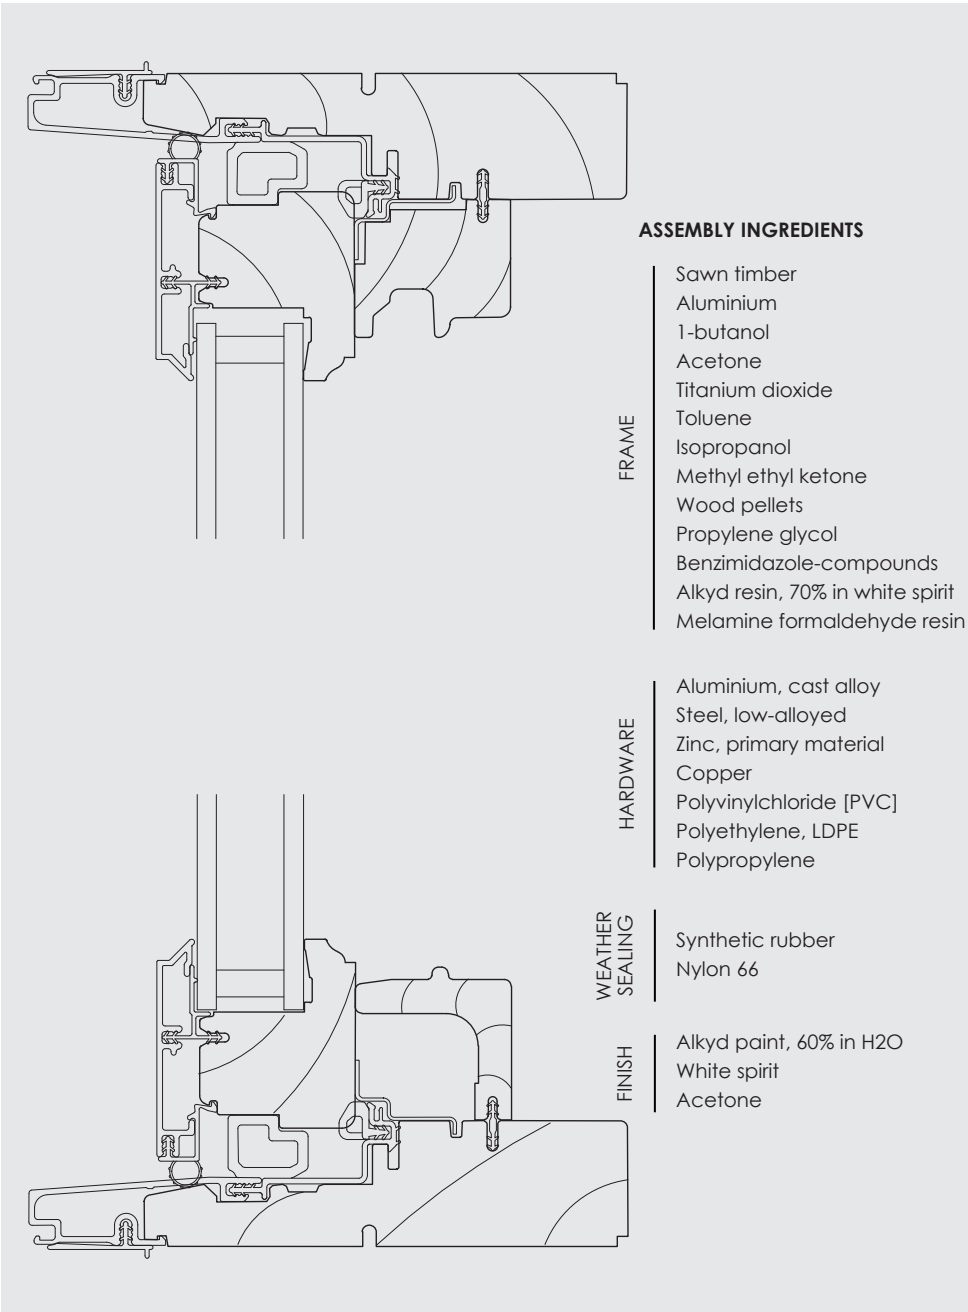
Aluminium-clad wood casement window detail: section detail and ingredients list
